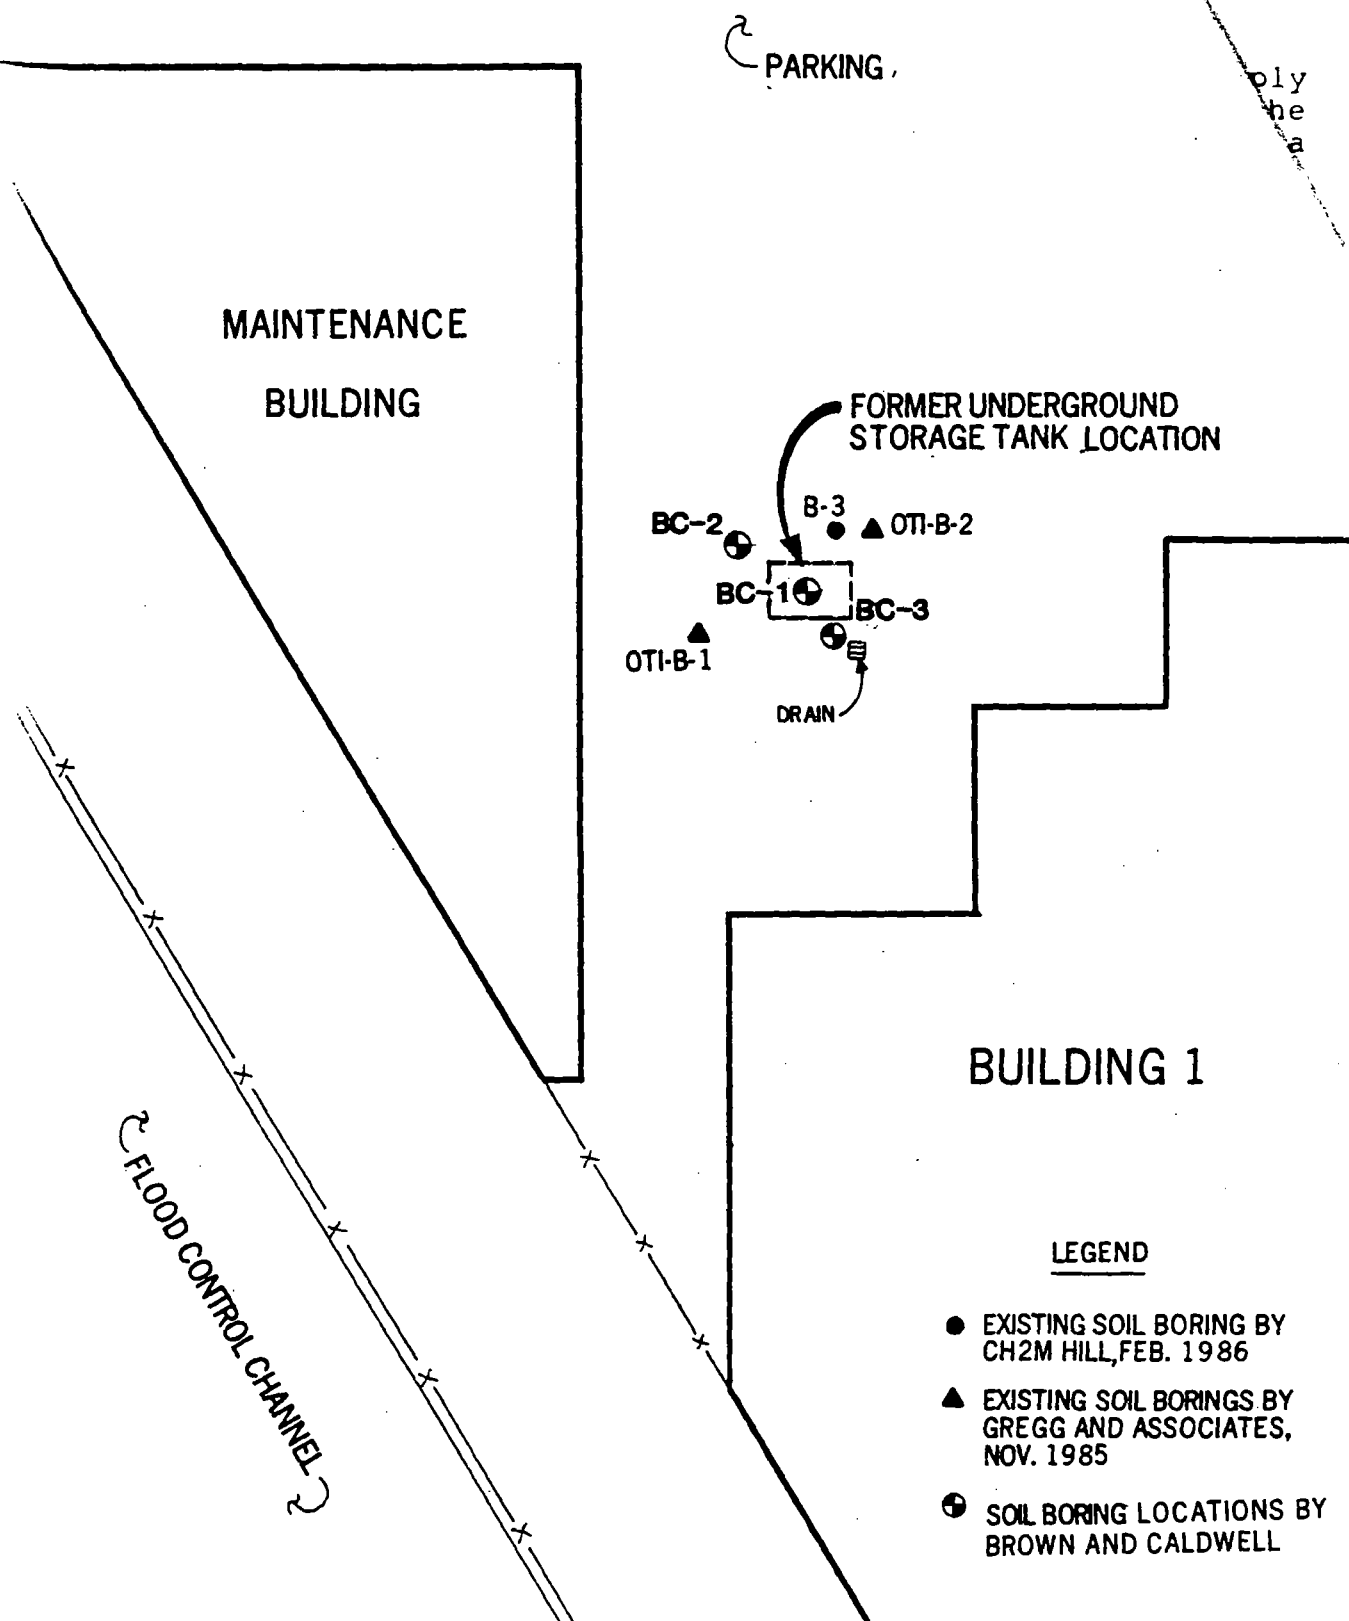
Former Underground Storage Tank Location and Soil Boring Locations
